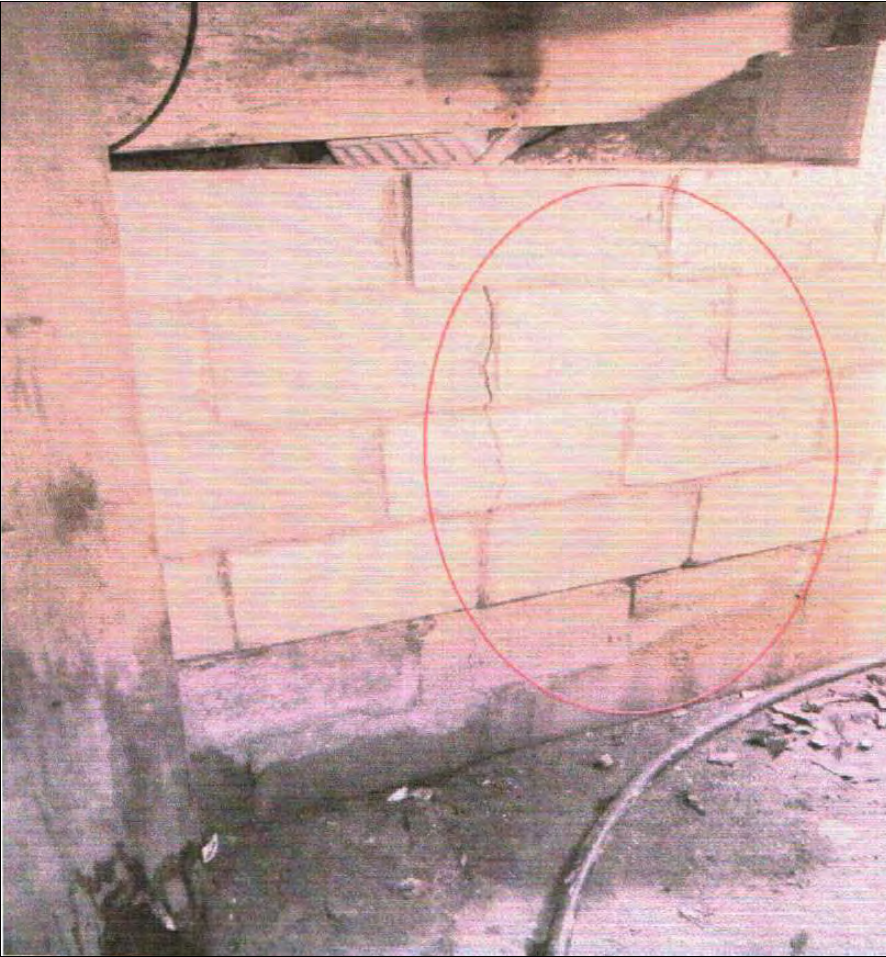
water damage, cracked “remedy” foundation wall
